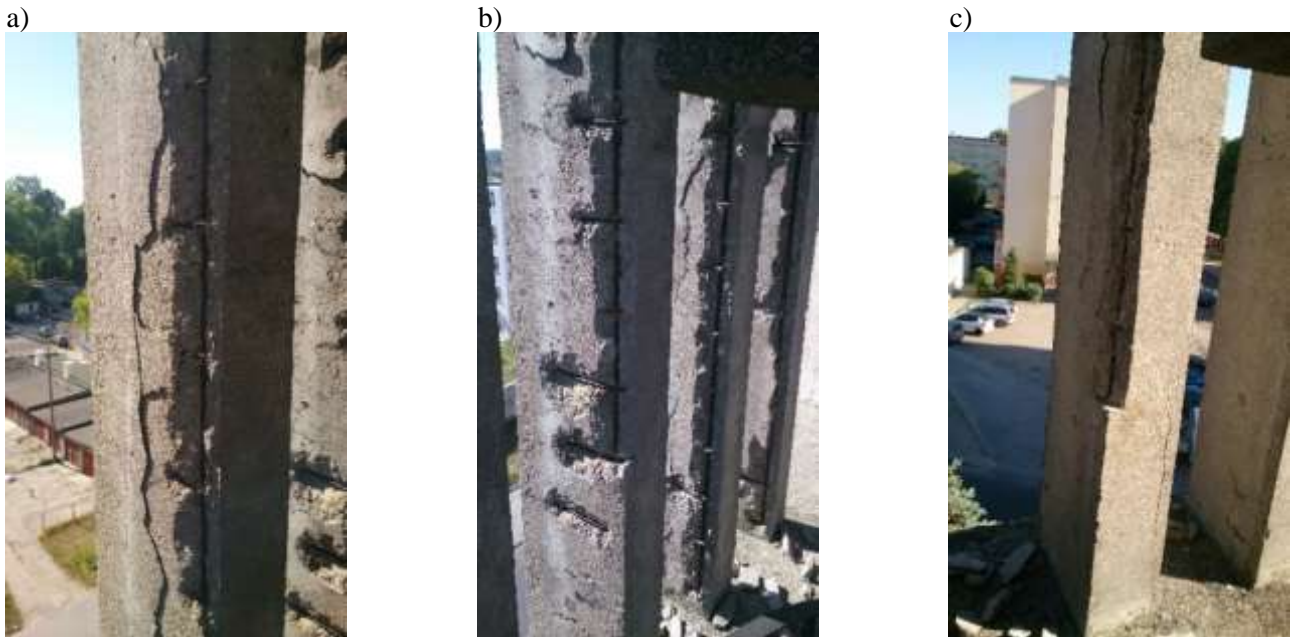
Examples of damage to the reinforced concrete prefabricated pillars of the belfry tower: a), b), c) losses of the concrete cover and corrosion of the reinforcement bars (photo by Maciej Niedostatkiewicz)
